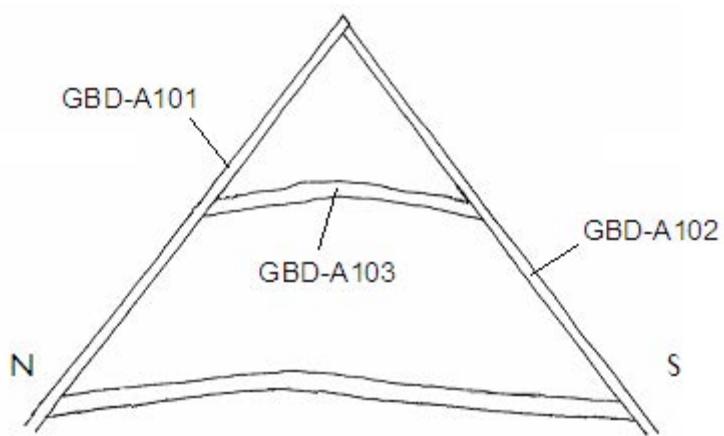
Stable; sketch of truss 1, showing the location of samples GBD-A101–3
